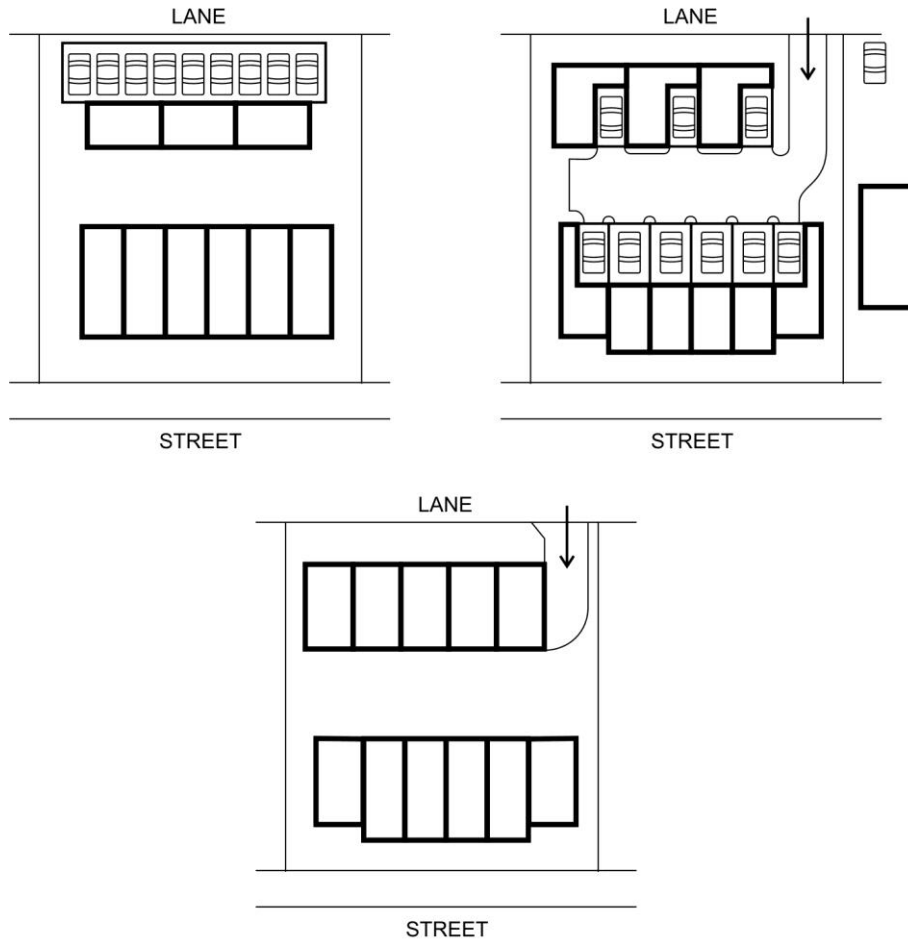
Courtyard-Rowhouse/Townhouse in a Courtyard Configuration with Underground Parking
